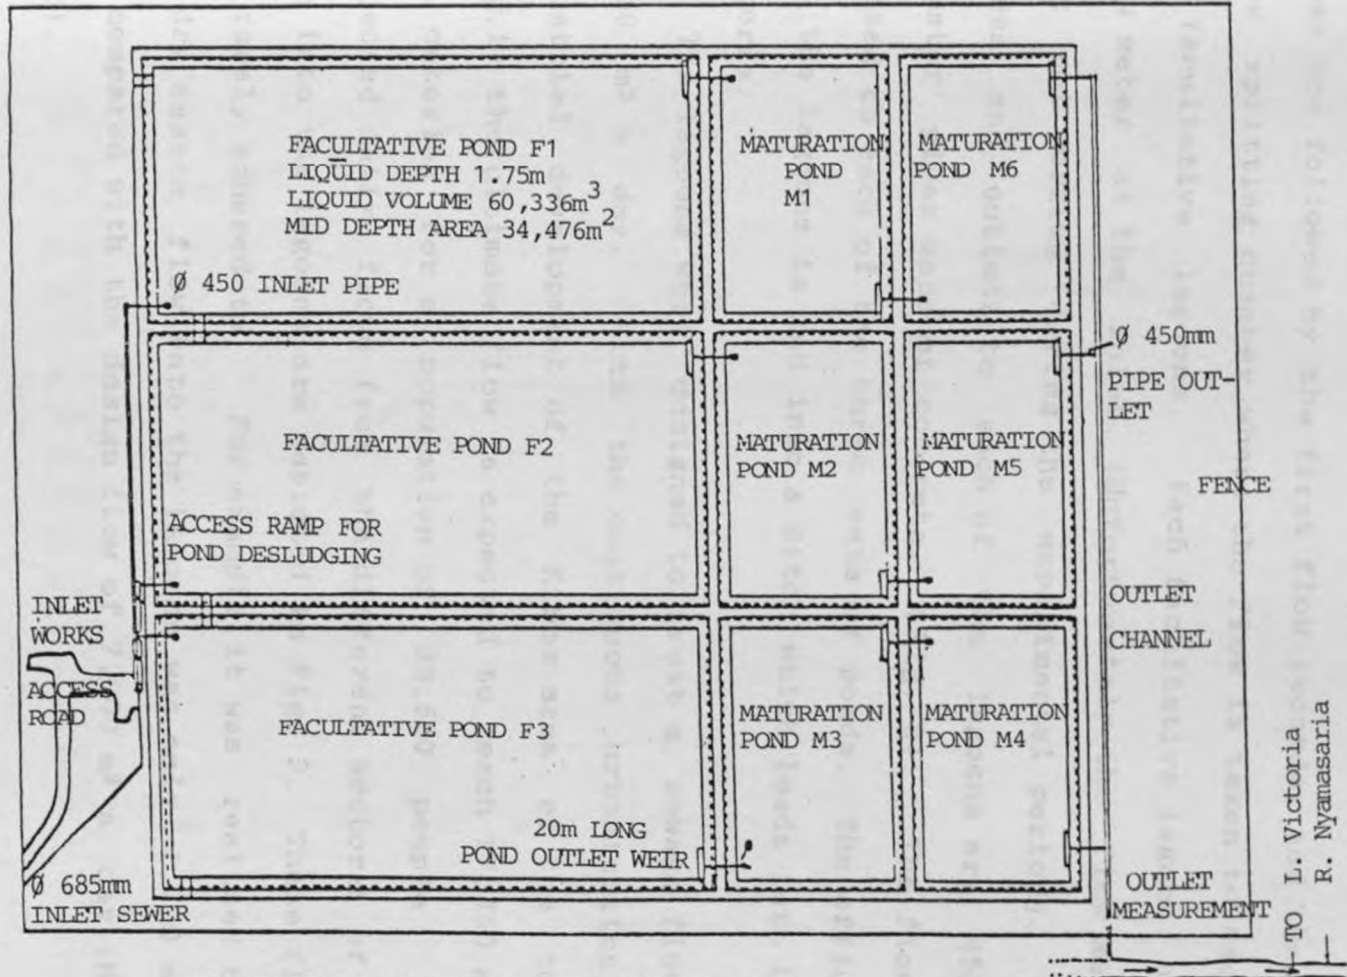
The layout of Nyalenda wastewater lagoons, Kisumu.
